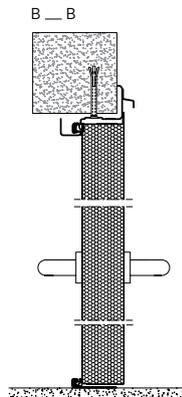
Vertical cross-section of the ECO external seamless steel door with a corner frame without a thermal break
